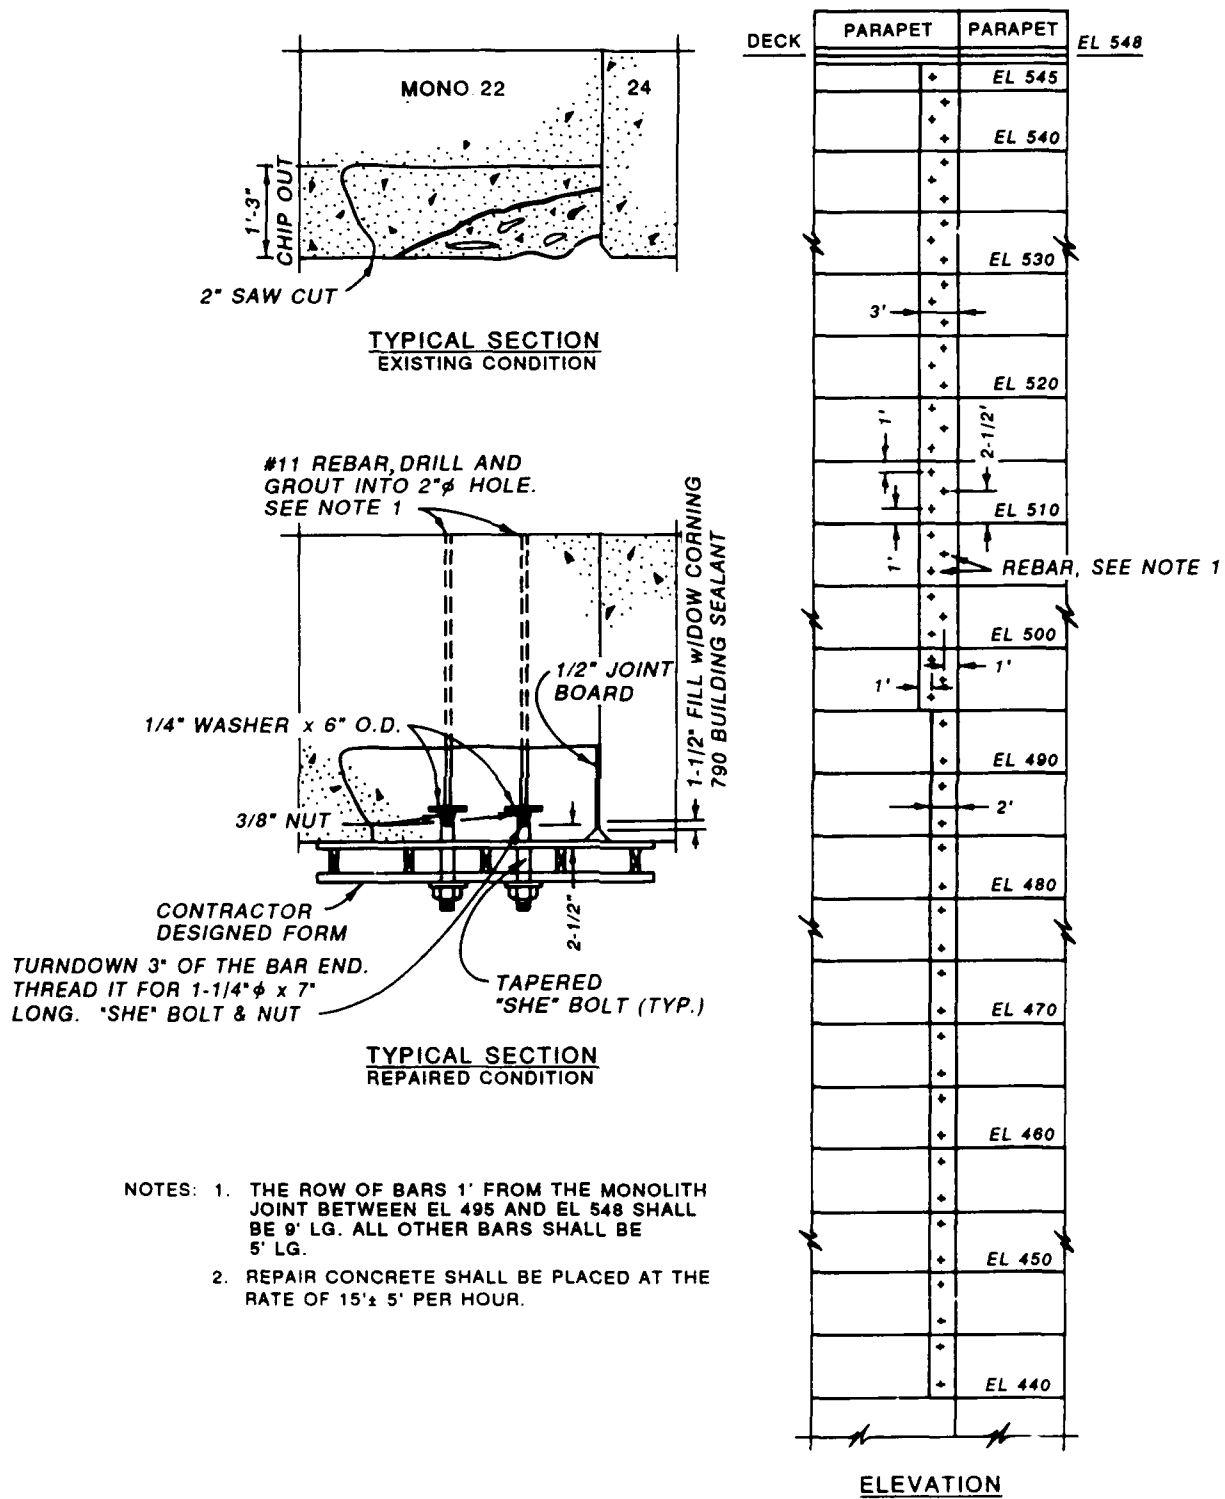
Monolith joint repair details, Lower Monumental Lock and Dam
